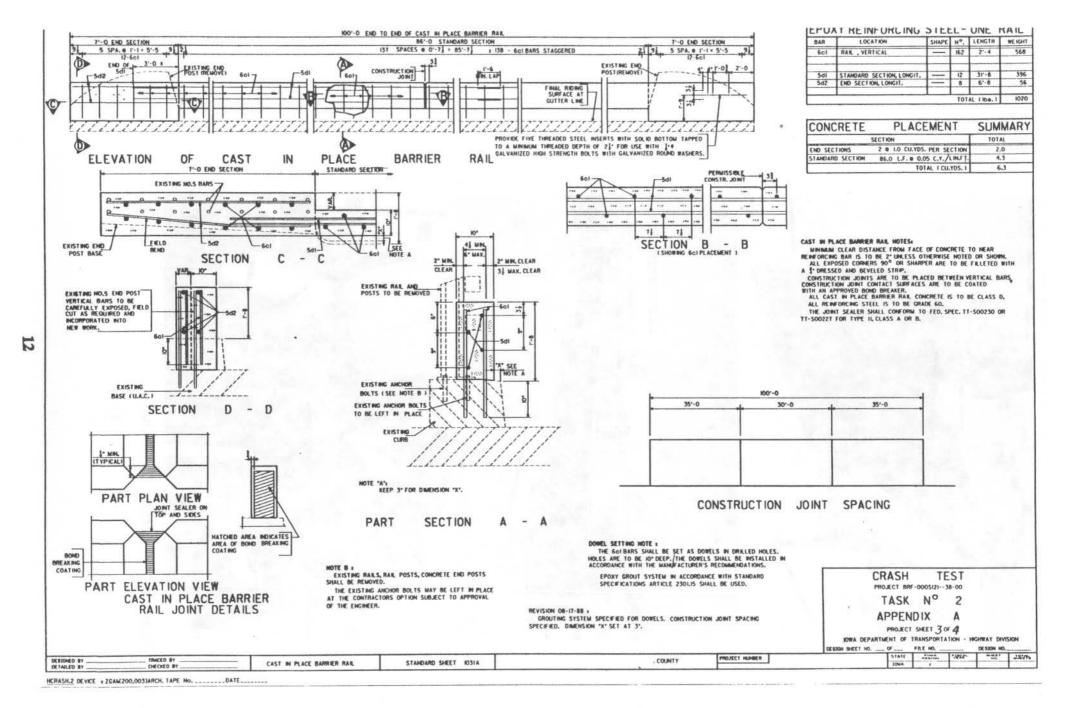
Sketch of the Iowa Retrofit Concrete Barrier Rail.
